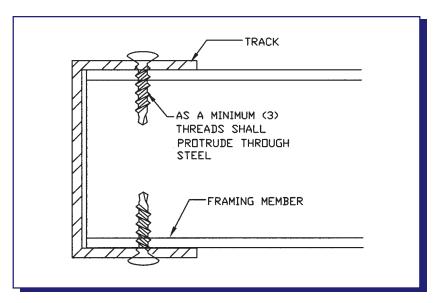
Steel-to-Steel Screw ConnectionReprinted by permission of Light-Gauge Steel Engineers Association
